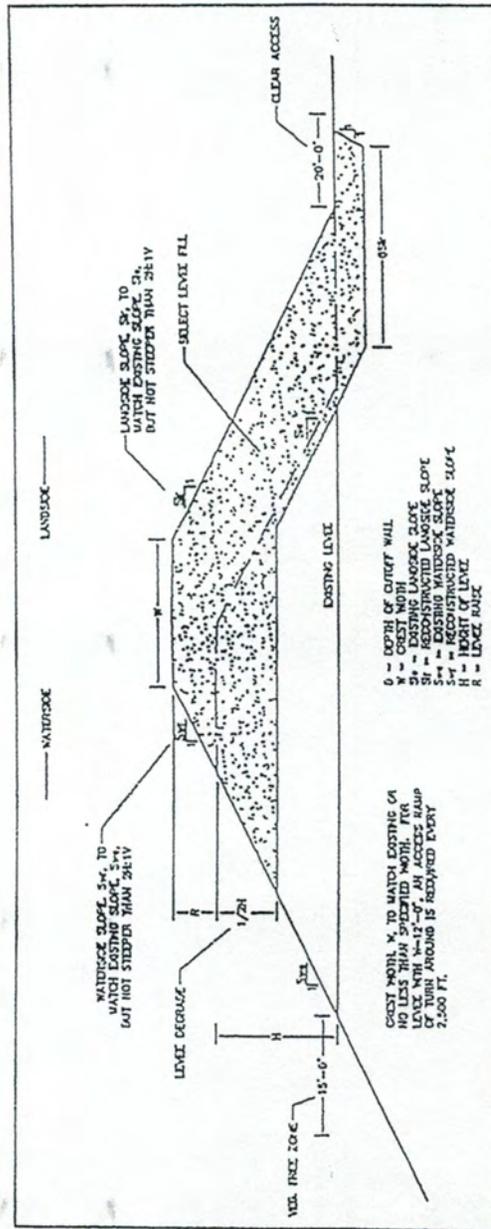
Levee Reshaping and Levee Raise Typical Plan. Note that the landside easement (right side) shown would be the maximum clear access easement; landside easements would range from 10 feet to 20 feet from the levee toe. Half levee degradation is generally not proposed unless a cutoff wall would be installed. Instead, an internal drain may be constructed between the existing levee materials and the new fill.
